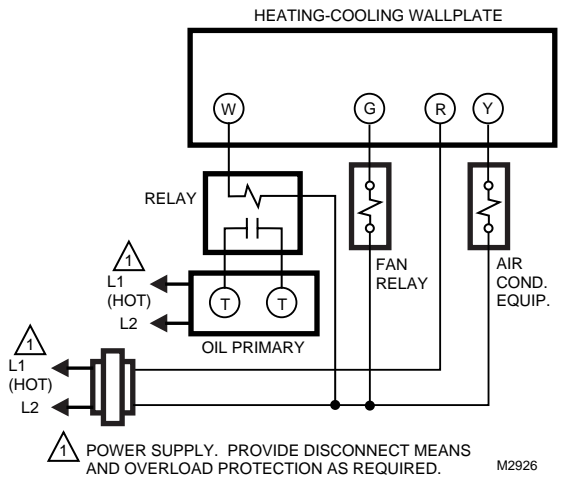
T8602C,D heating/cooling circuit in an oil heating and electric cooling system. Heating transformer is in oil primary.
